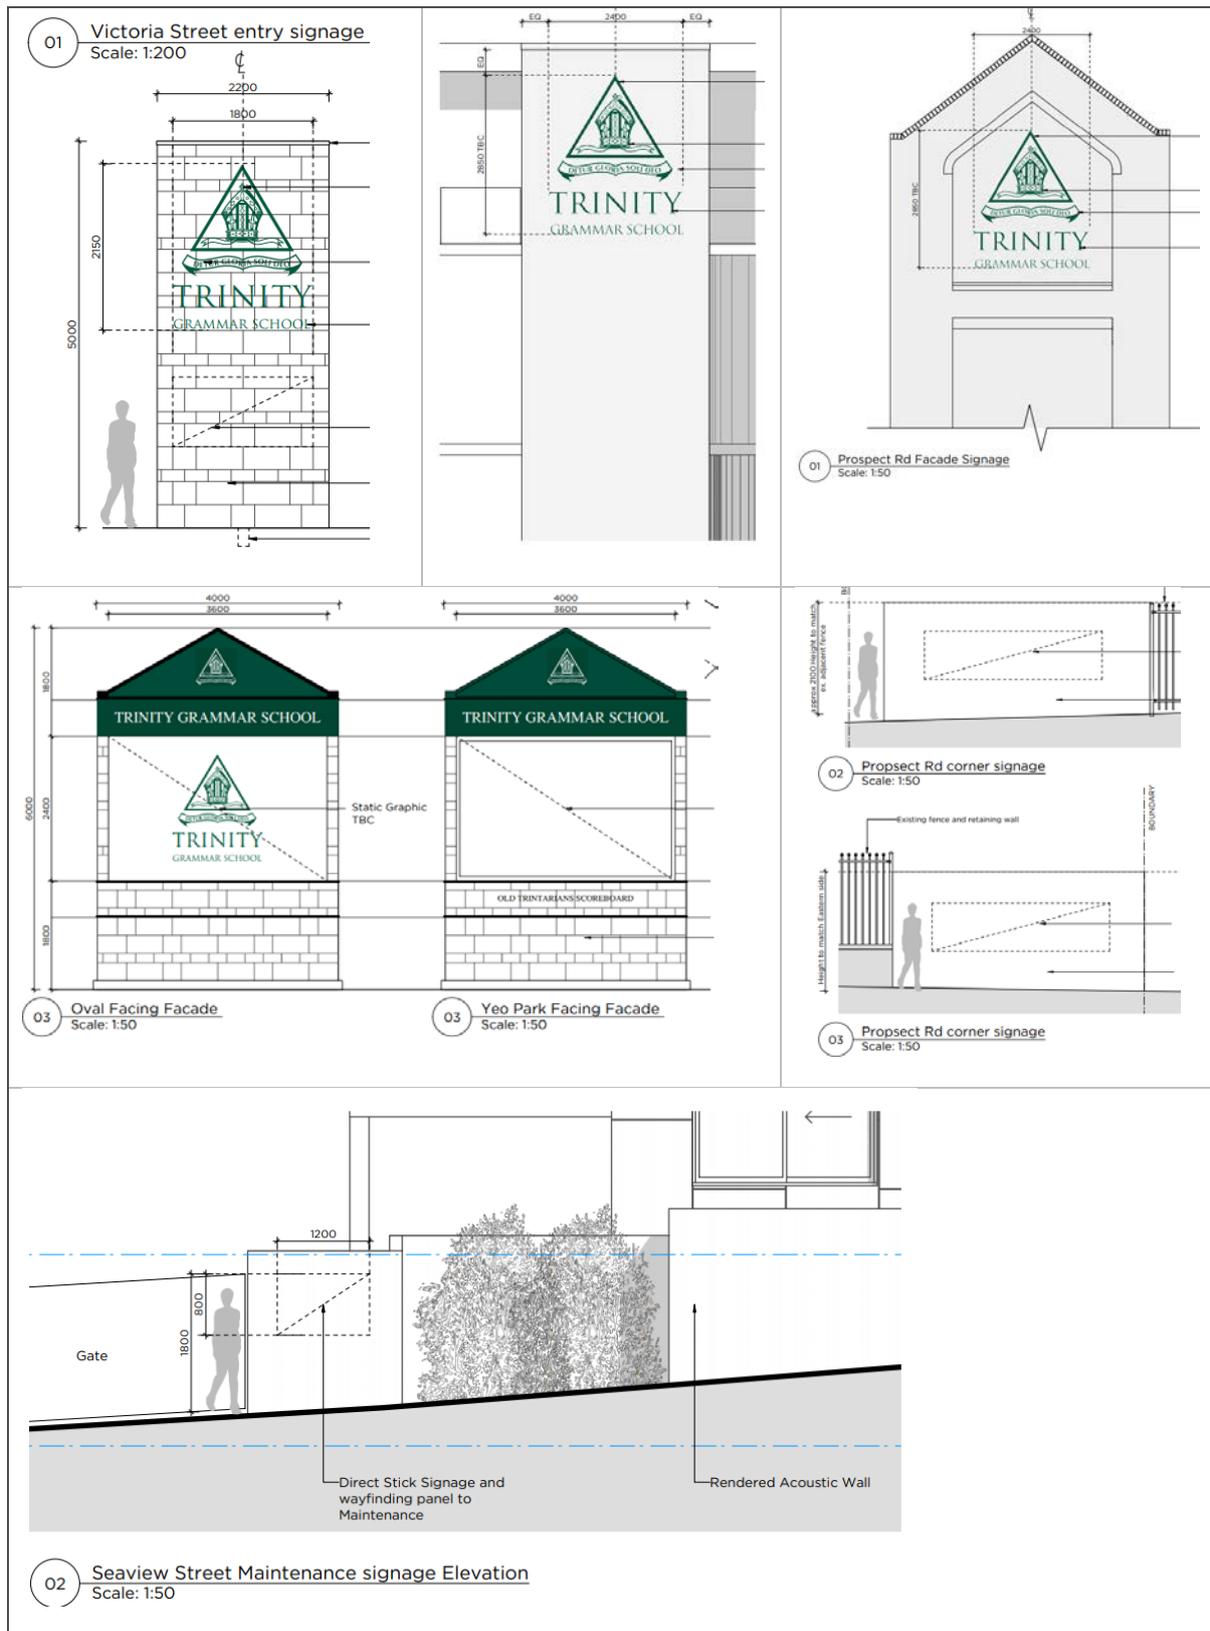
| Proposed signs on site (Source: Applicant's SRtS 2021)
